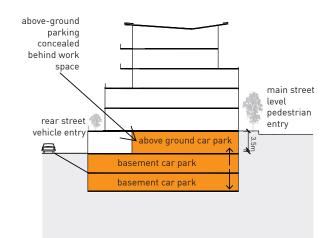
B.2-3: Above ground car parking is permitted on steep sites.
